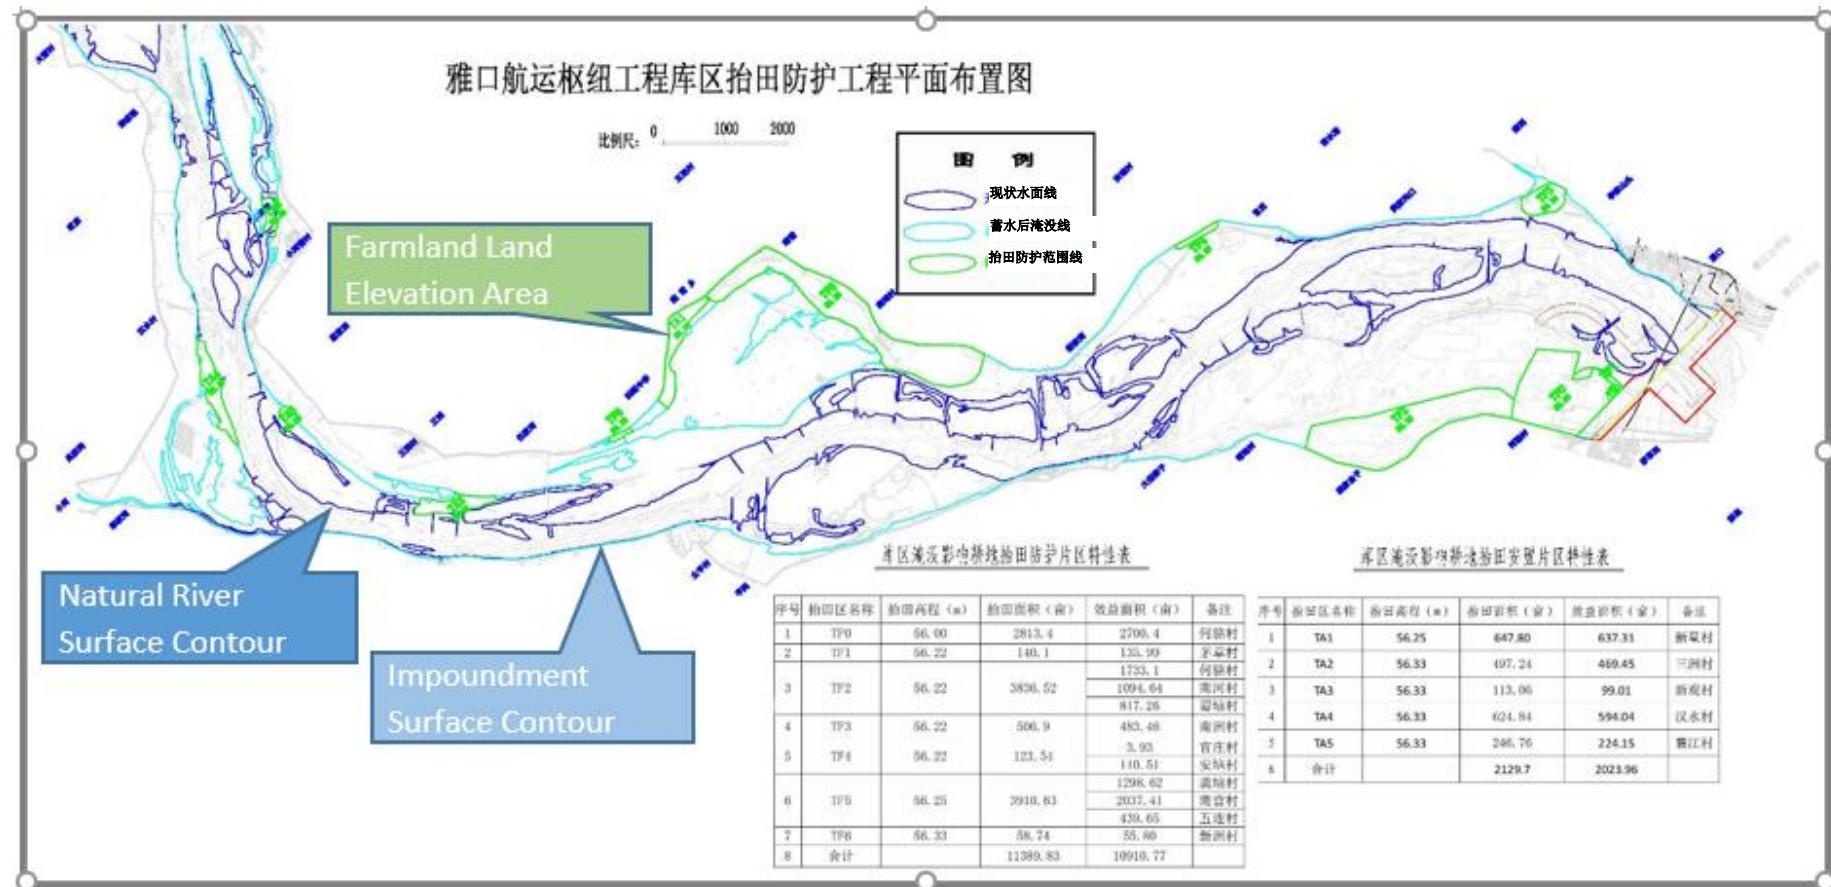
Plan layout of land-lifting protection works of the reservoir area
